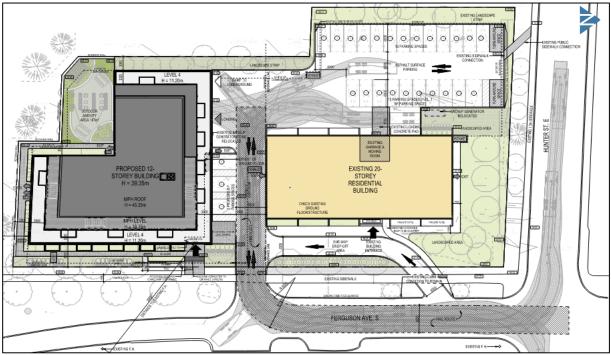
Architectural Ground Floor Plan (BDP Quadrangle, November 27, 2023)
